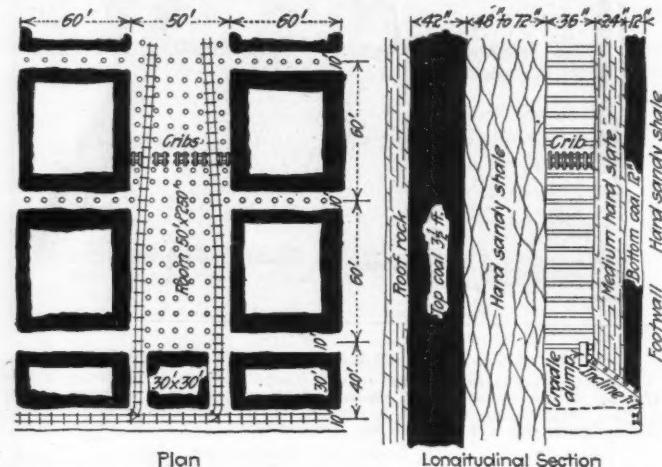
PLAN AND ELEVATION WORKING MIDDLE SEAM
